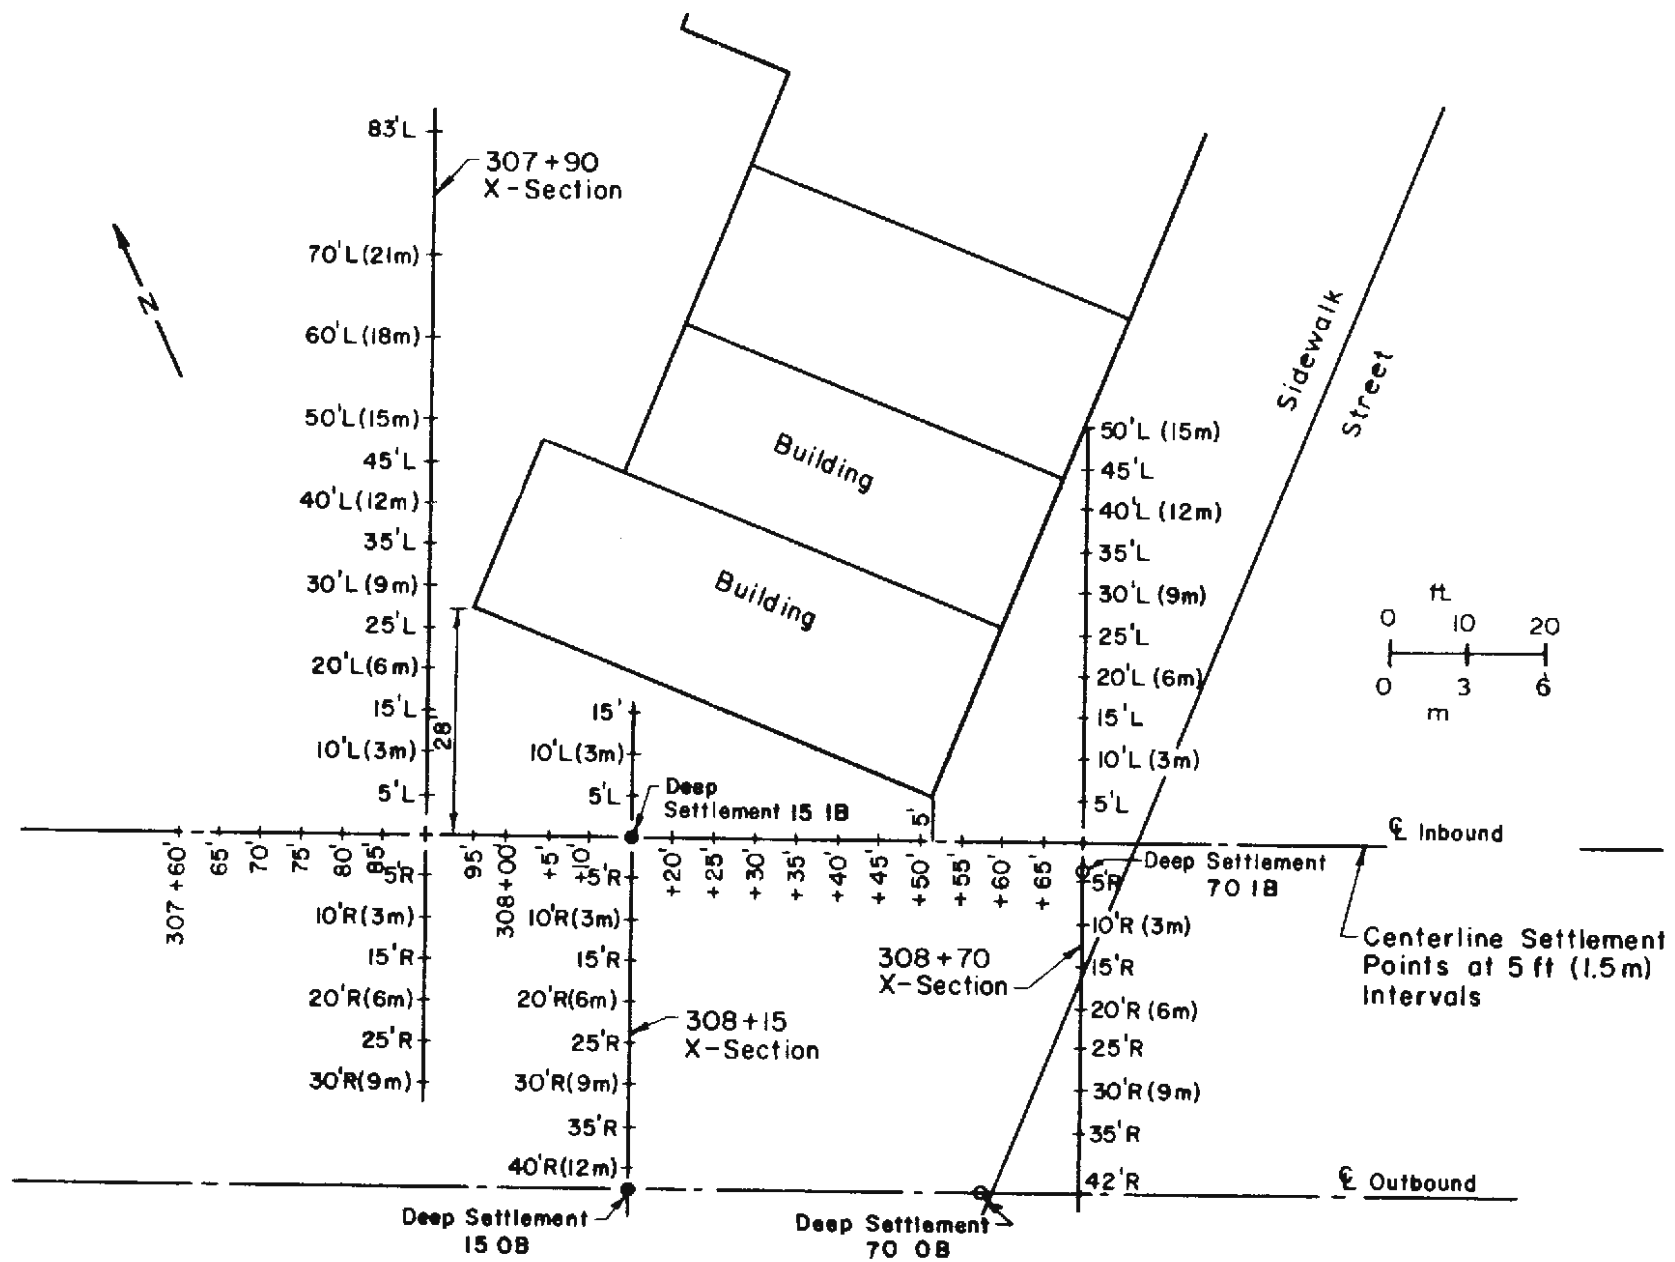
DETAILS OF SECTION G1 SETTLEMENT CROSS-SECTIONS
